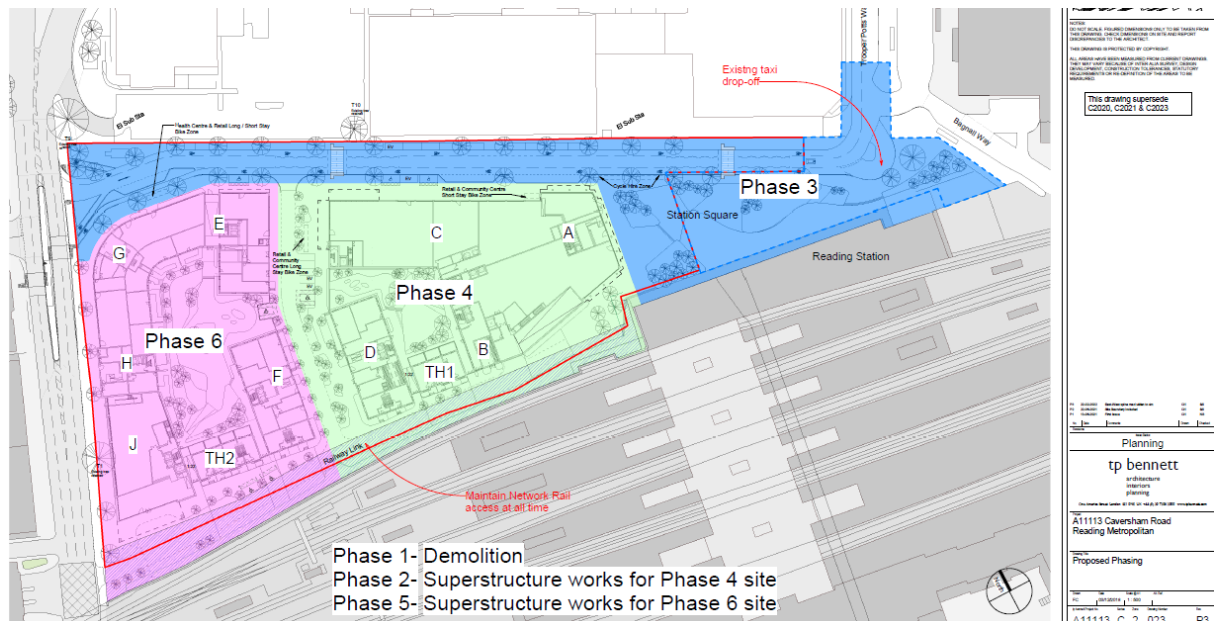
Phasing Plan A11113 C 2 023 Rev P3, as received 22/02/2022 - the applicant defines superstructure as “All work to the buildings in creating the structure and finishes above ground floor slab level”
